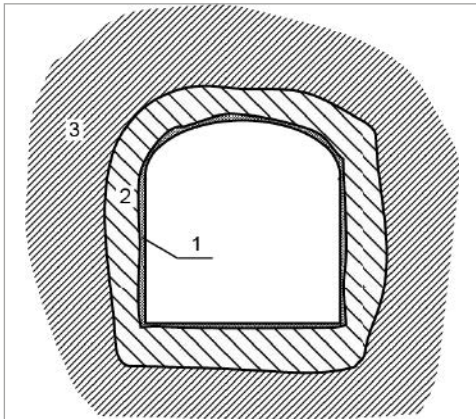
Proposed cross-section of disposal excavations: 1 – spray-concrete lining, 2 – EDZ, 3 – intact rock
